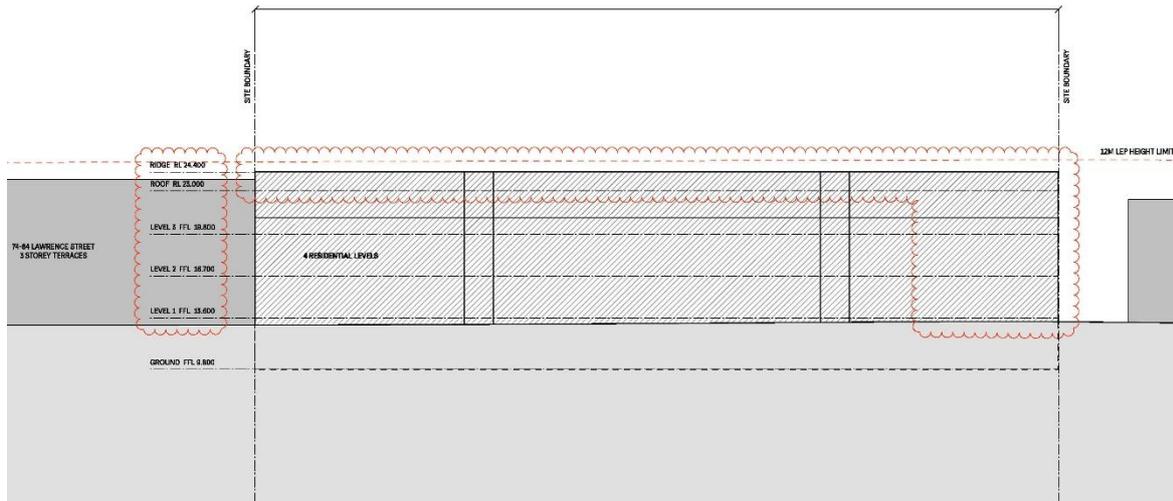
Building B: Lawrence Street elevation of original modification presented to CSPC in July
